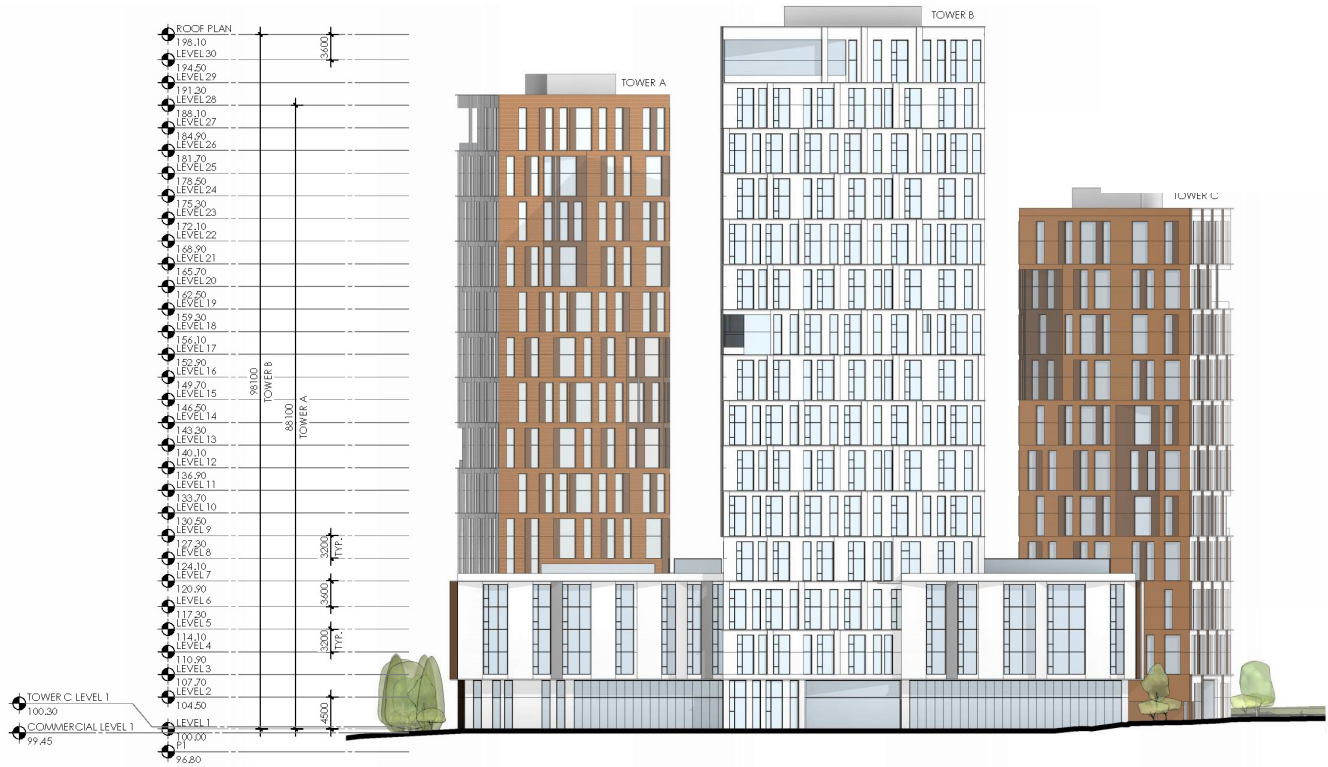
FIGURE: Western building elevations facing Courtland Avenue East (ABA Architects).
